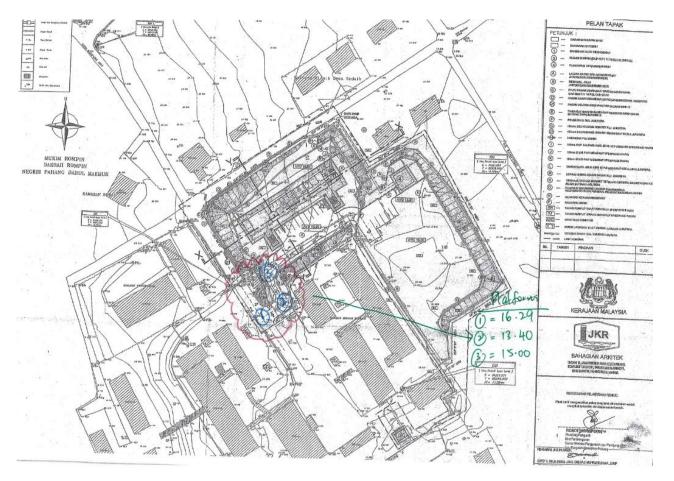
Site Plan of Sekolah Kebangsaan Kedaik, Rompin, Pahang.
